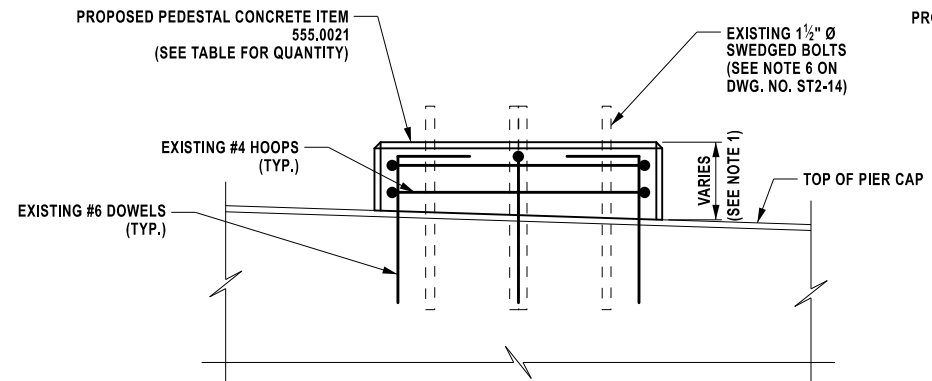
PEDESTAL RECONSTRUCTION PLAN - INTERIOR COLUMN
